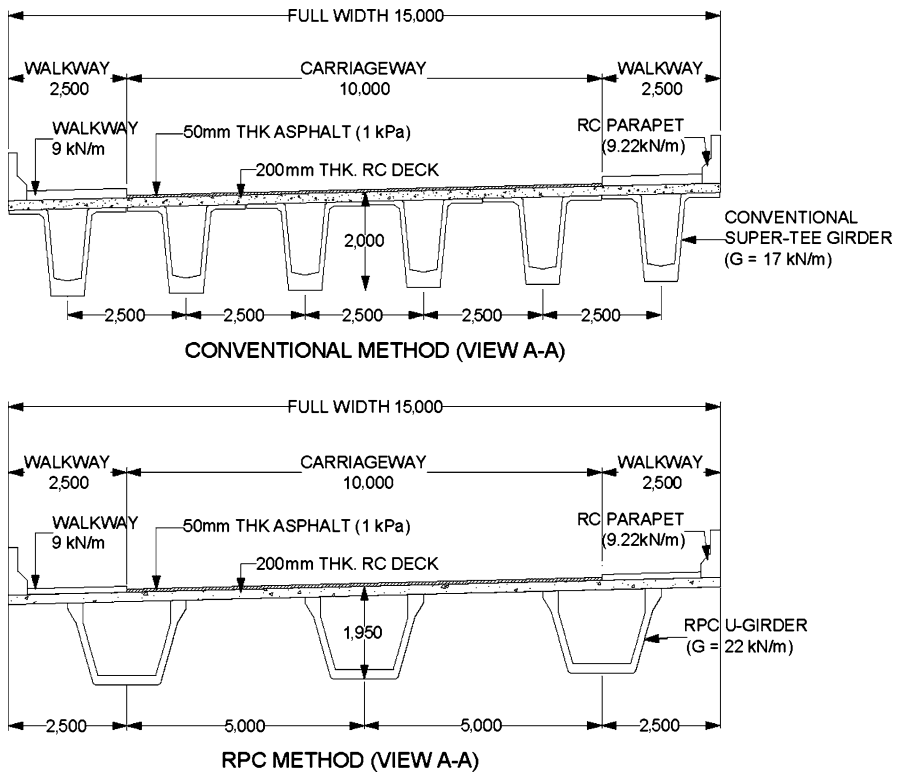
Comparison of cross sectional view for conventional Super-T girders design and RPC U-girder design
